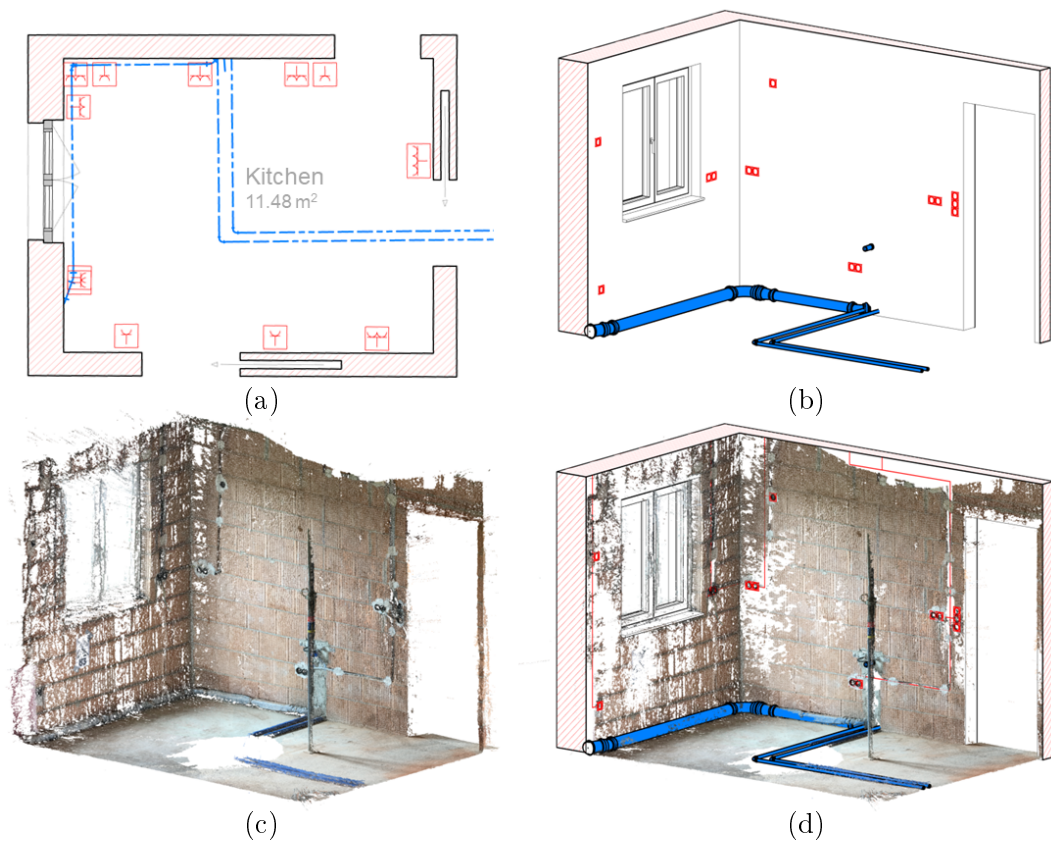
Room with MEP installations: a) Floor plan with general electrical and plumbing symbols, b) 3D visualization of the initial BIM, c) Image based 3D point cloud, taken at the time when the walls had open slots with cable and cavity wall boxes for electrical outlets to be installed. In addition, the as-built capture already documents the horizontally laid drainpipe and pipes for water supply in the kitchen, d) Updated BIM showing the as-built condition of the electrical cables in the walls, overlaid with the georeferenced point cloud.
